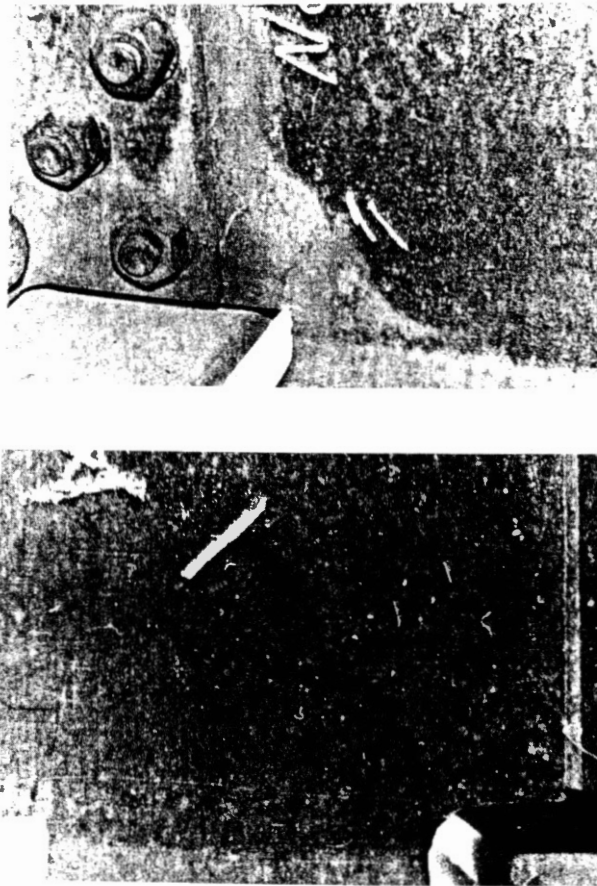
Cracks Found in the Stringer Detail of Bridge 51.5 (2)
